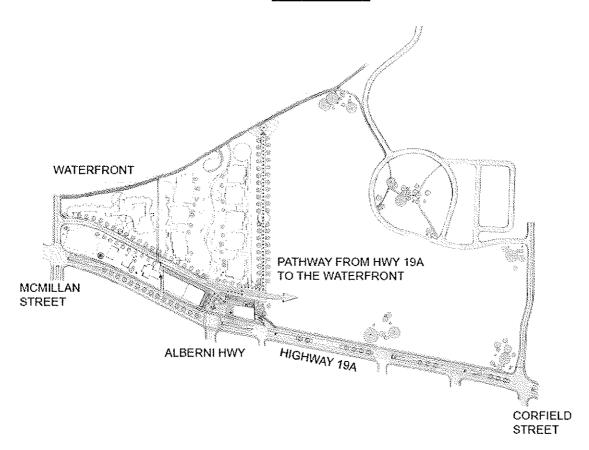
(a): Overview of the design concept for the City-owned lots, showing connection from Highway 19A to the waterfront
